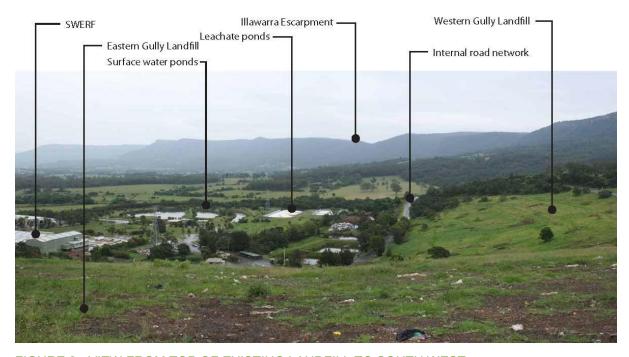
VIEW FROM TOP OF EXISTING LANDFILL TO SOUTH WEST
